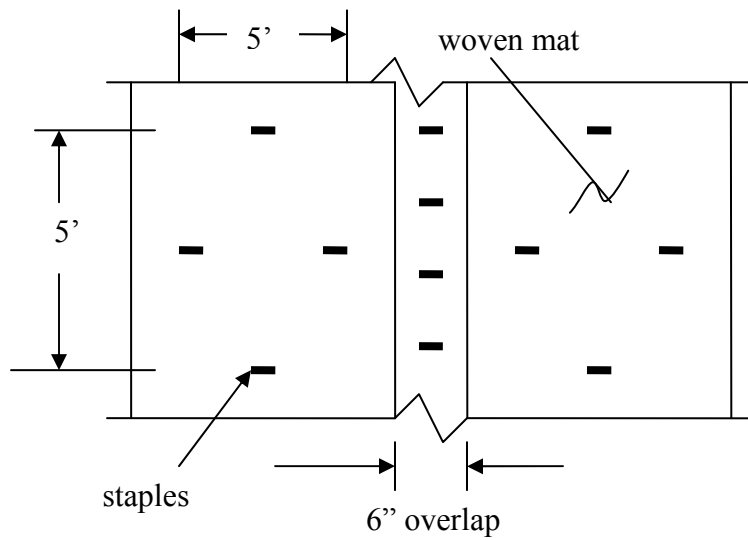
Turf Reinforcement Mat (TRM) staple installation layout.
